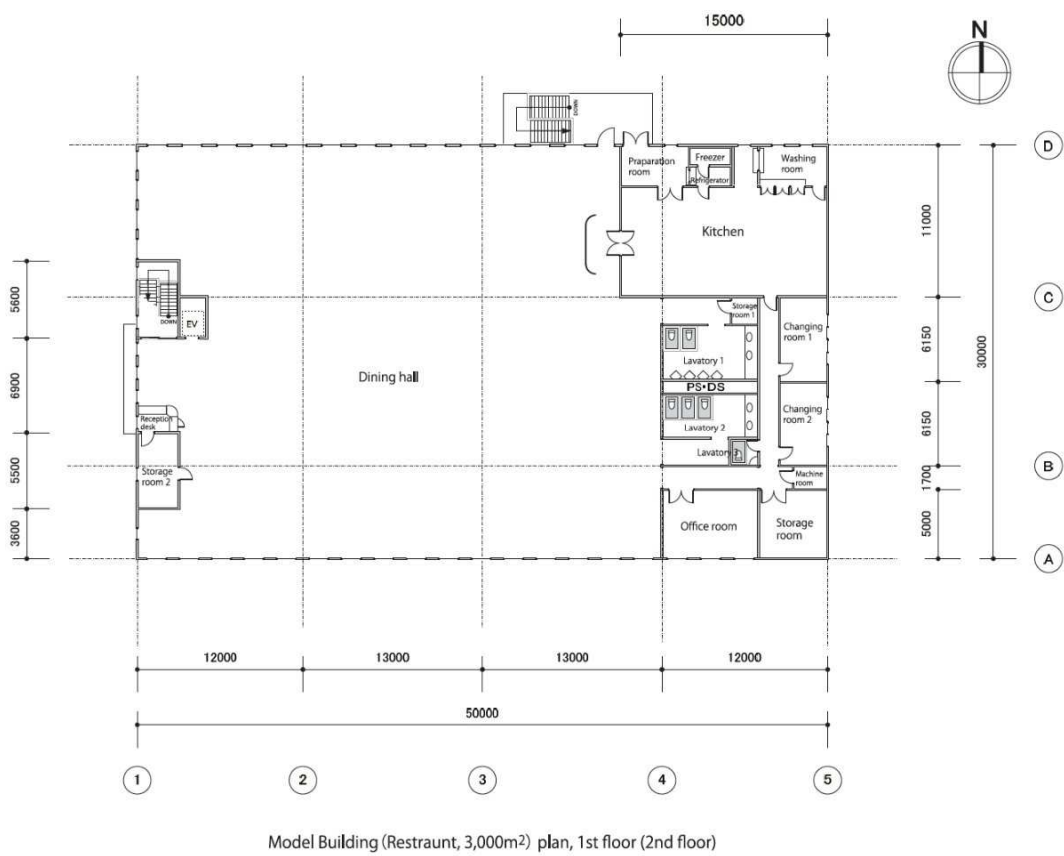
Model building (restaurant, 3 000 m²) plan, first floor (second floor)
